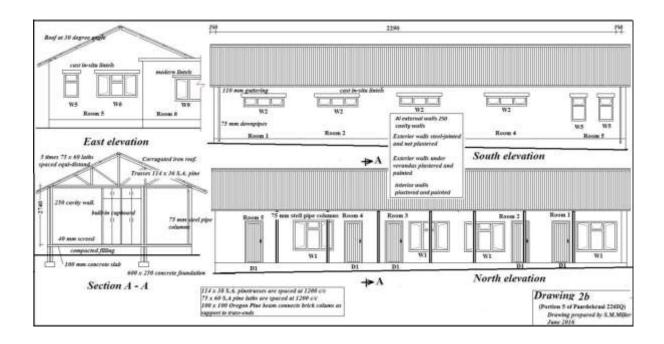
Above. Eastern, Southern and Northern elevations of the building captured in Drawing 2. (Drawing S.M. Miller 2016.)
